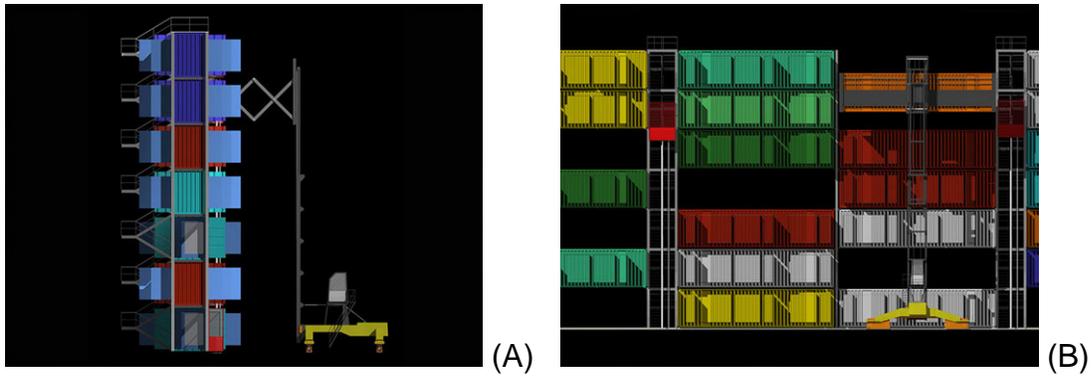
LOT-EK ISBU Docking Station (Lot-EK, n.d.). A) MDU Housing Plan Section View, (B) MDU Housing Plan Elevation View
